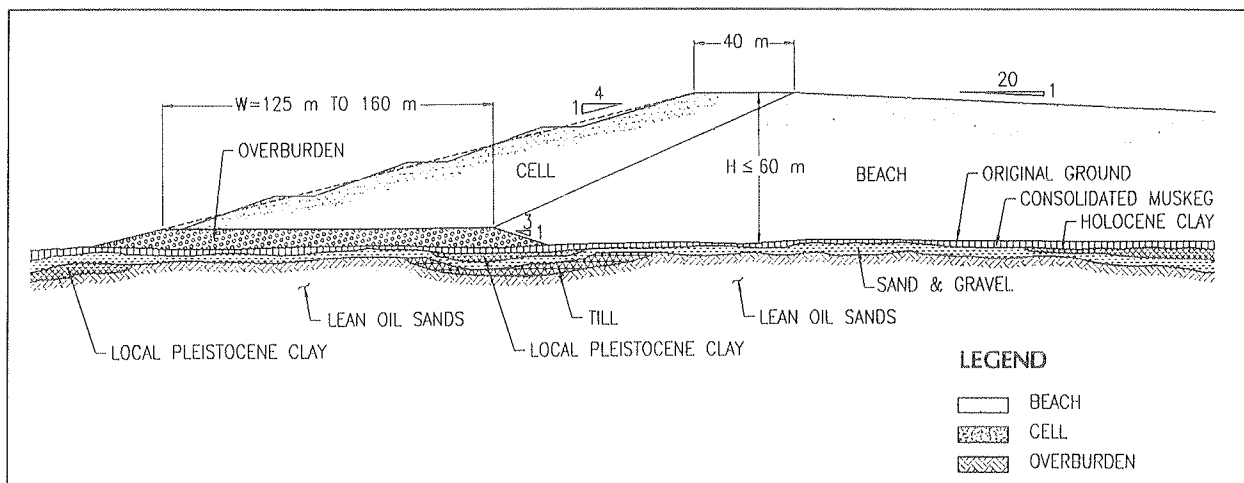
Typical Tailings Settling Pond Dyke Cross-Section
